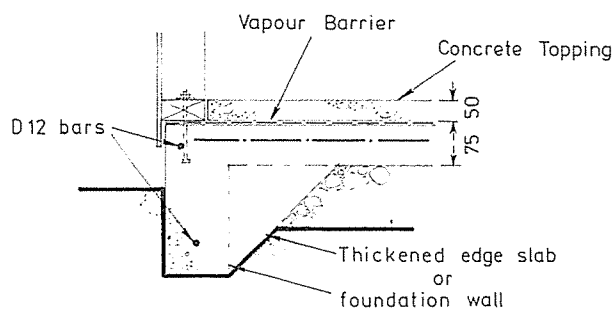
Vapour barrier laid over ground slab and protected by concrete topping
